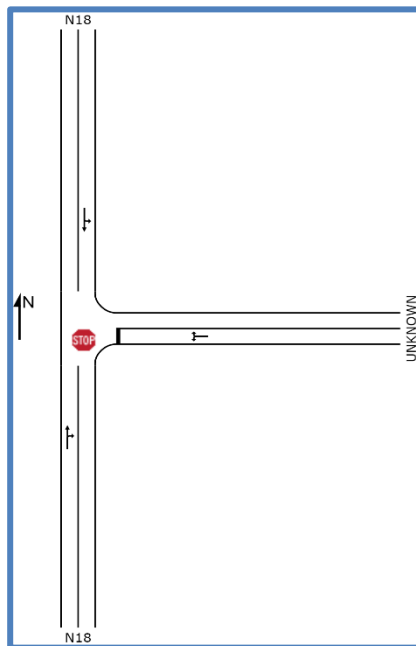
Existing Layout of N18 and Suid Street Intersection
